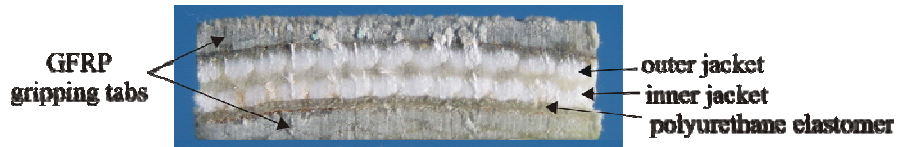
End view of exhumed liner coupon with gripping tabs attached
